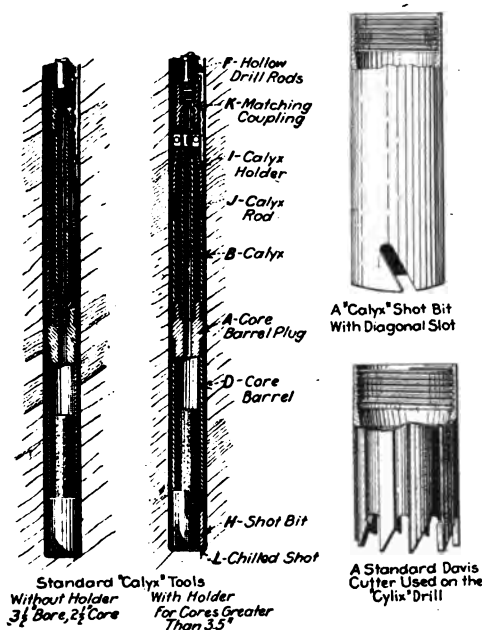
Cutting bits used in chilled shot drilling. (Ingersoll-Rand Co.)
